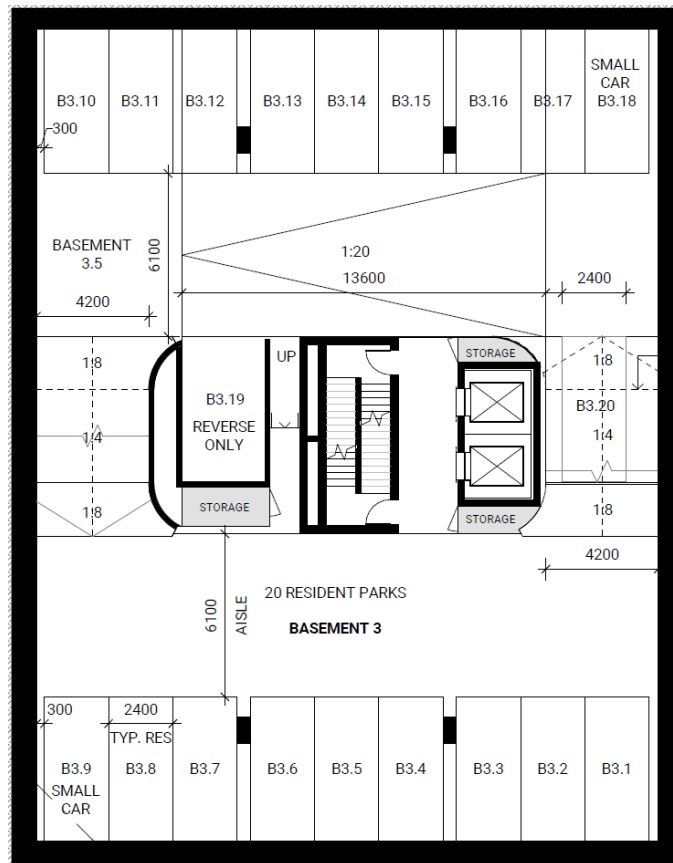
Proposed Basement 3 (Source: Plus Architecture)
